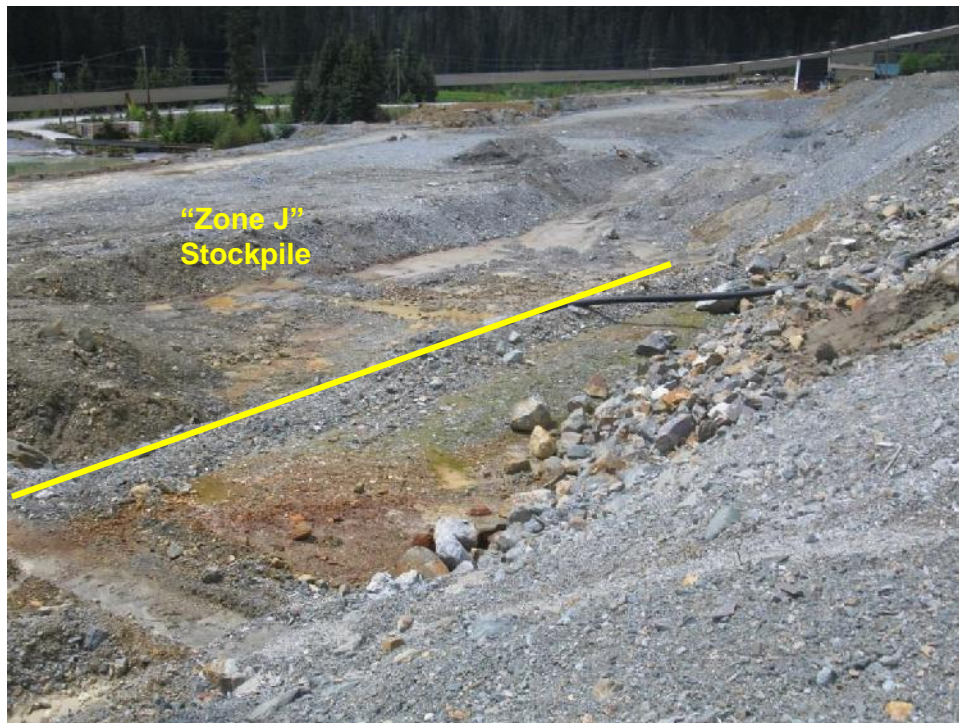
East portion of Lynx Dam lower benches and toe area, looking southwest
